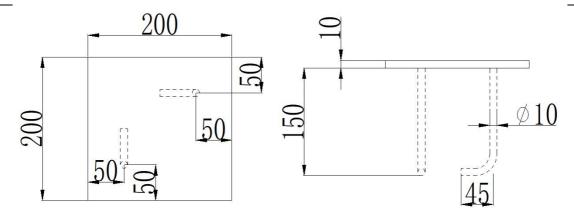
Iron Plate Size for Equipment Installation (unit: mm)
